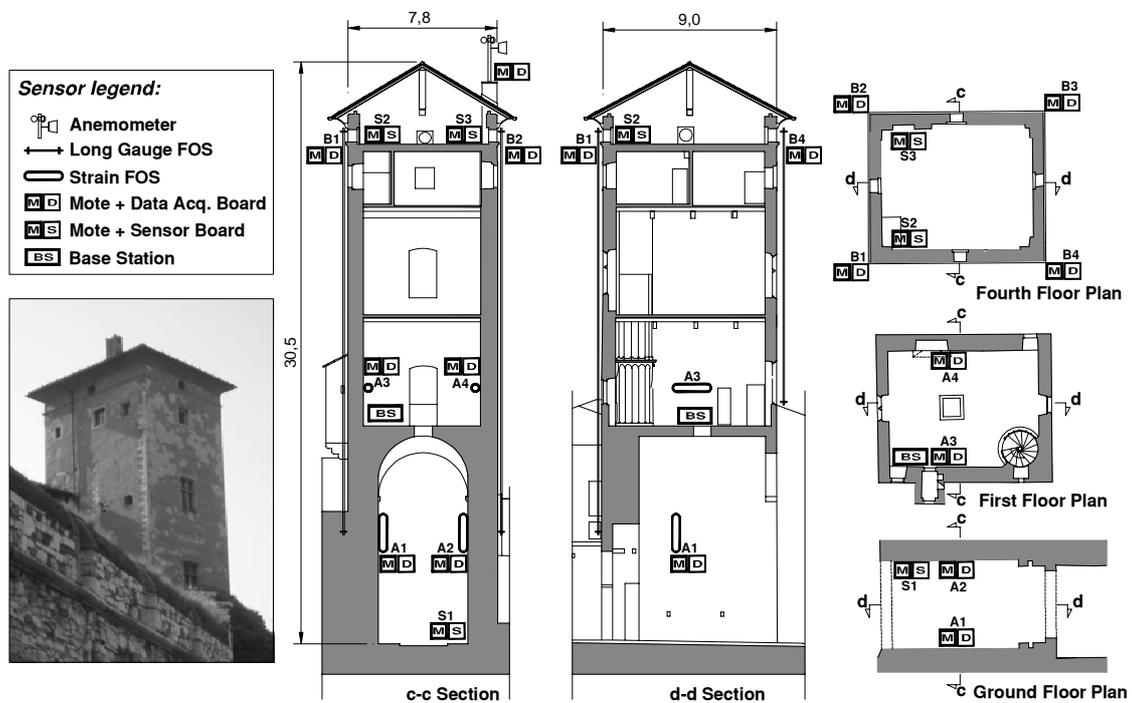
Overview of the Tower; plan view and cross sections showing the instruments to be installed.
